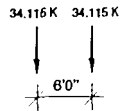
Transverse Live Load Positioning for Floor Beam Section No. 6
